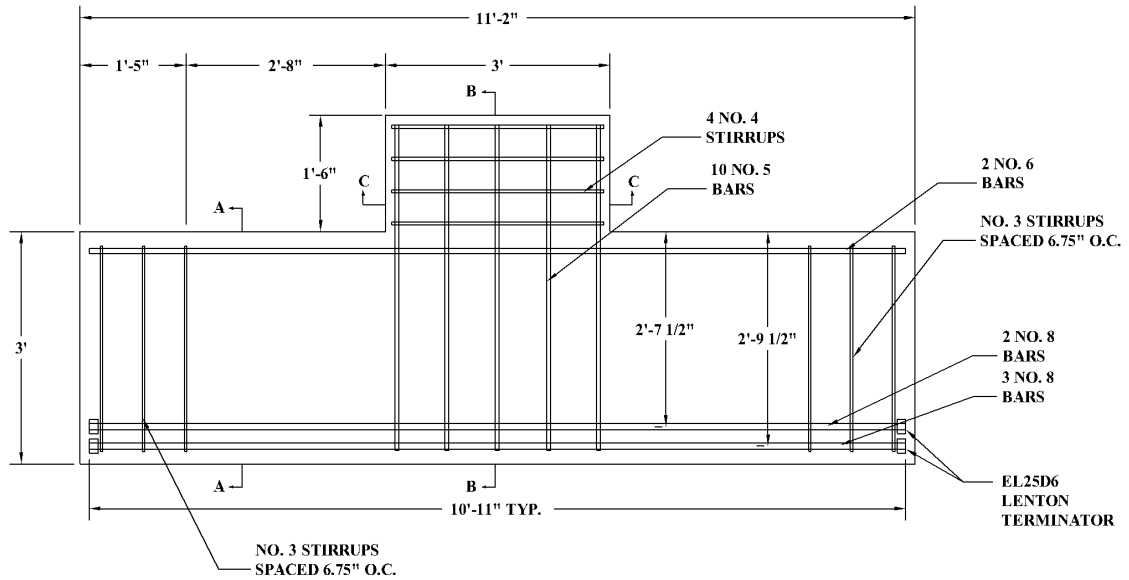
Design drawing of specimens with no internal shear reinforcement
